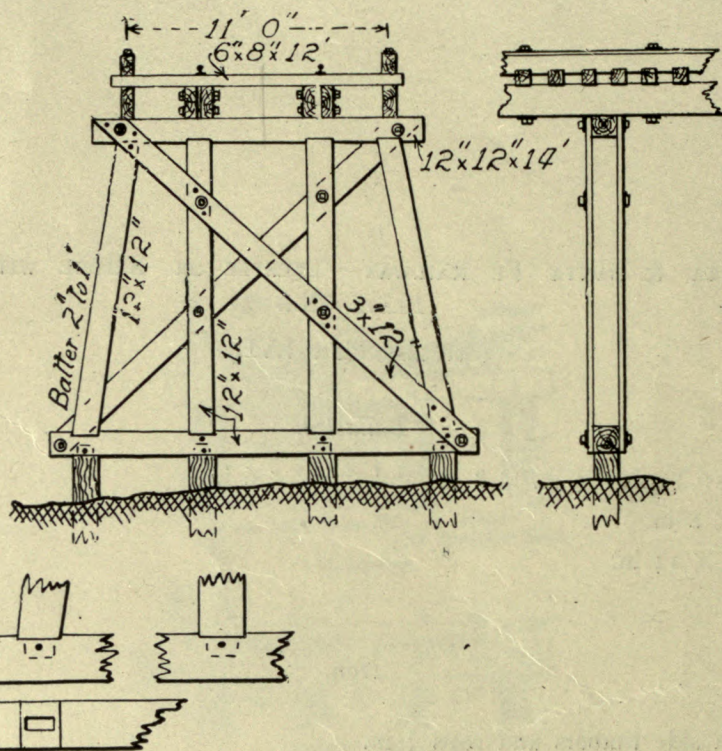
PLATE X.—STANDARD FRAMED TRESTLE, CHICAGO & WEST MICHIGAN RAILWAY.
